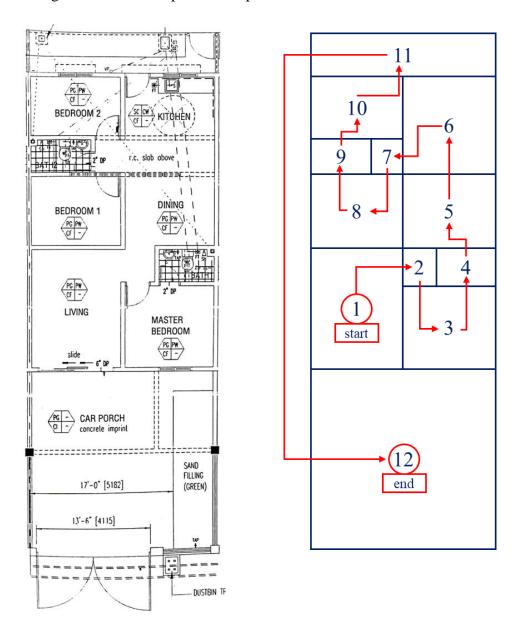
The floor plan and the PDI inspection workflow
